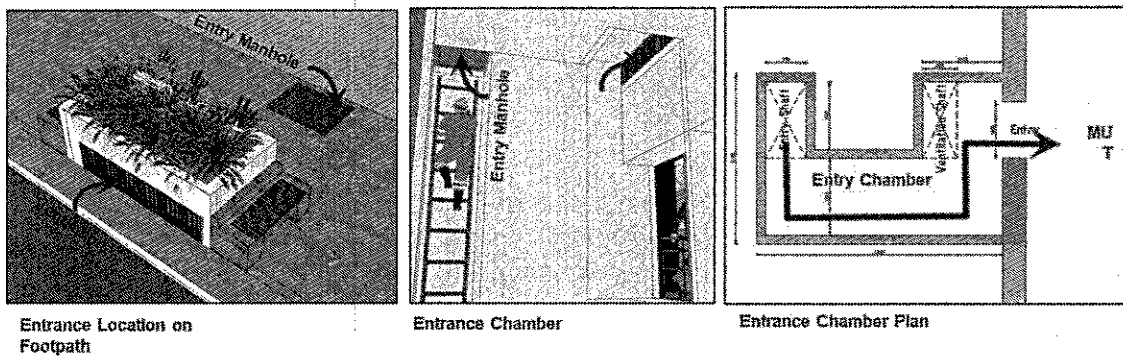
Proposed Multi Utility Tunnel Entrance Section
